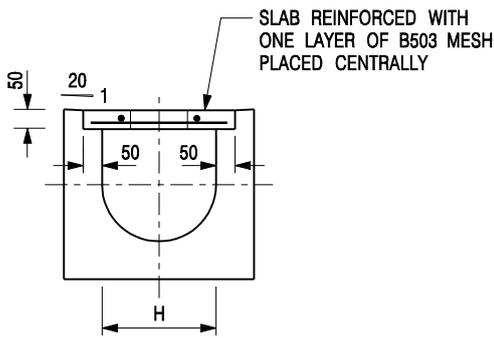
DETAILS OF HALF-ROUND AND U-CHANNELS (TYPE A - WITH MASONRY APRON)
